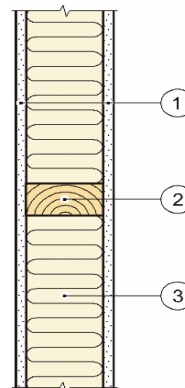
shows the principle design of standard external walls. The elements are storey-high and the length is adjusted to suit the house type and/or to facilitate transport.
